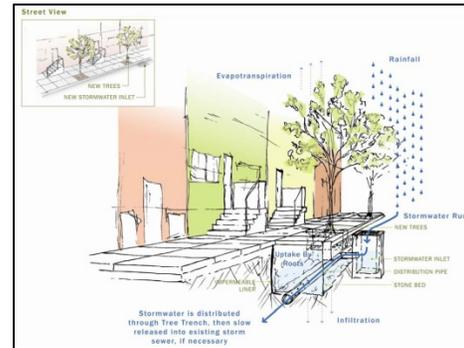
Continuous soil trenches under the sidewalk provide soil for trees and space for amenities.
